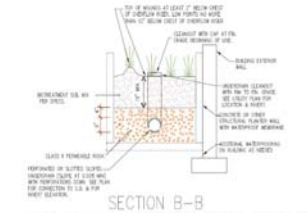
Cross section B-B of flow-through planter, shows cross section of underdrain
